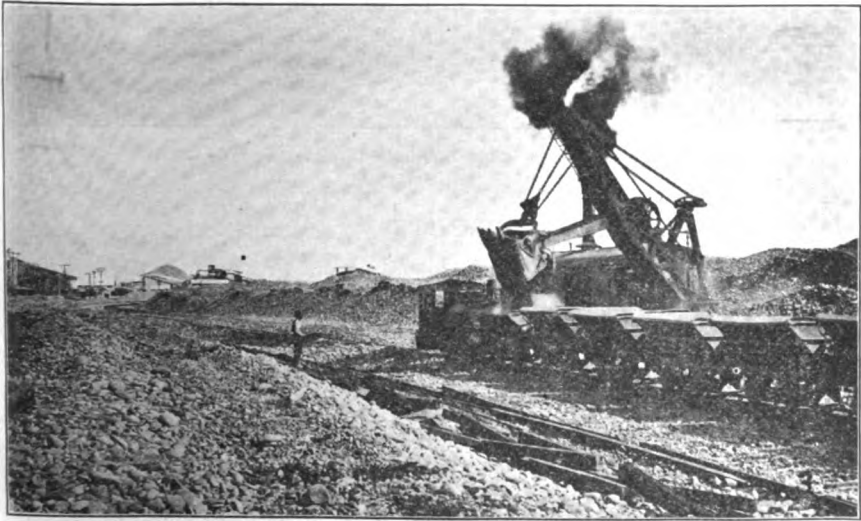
Loading cobbles with steam shovel for Natoma Rock Crushing Plant near Fair Oaks.
